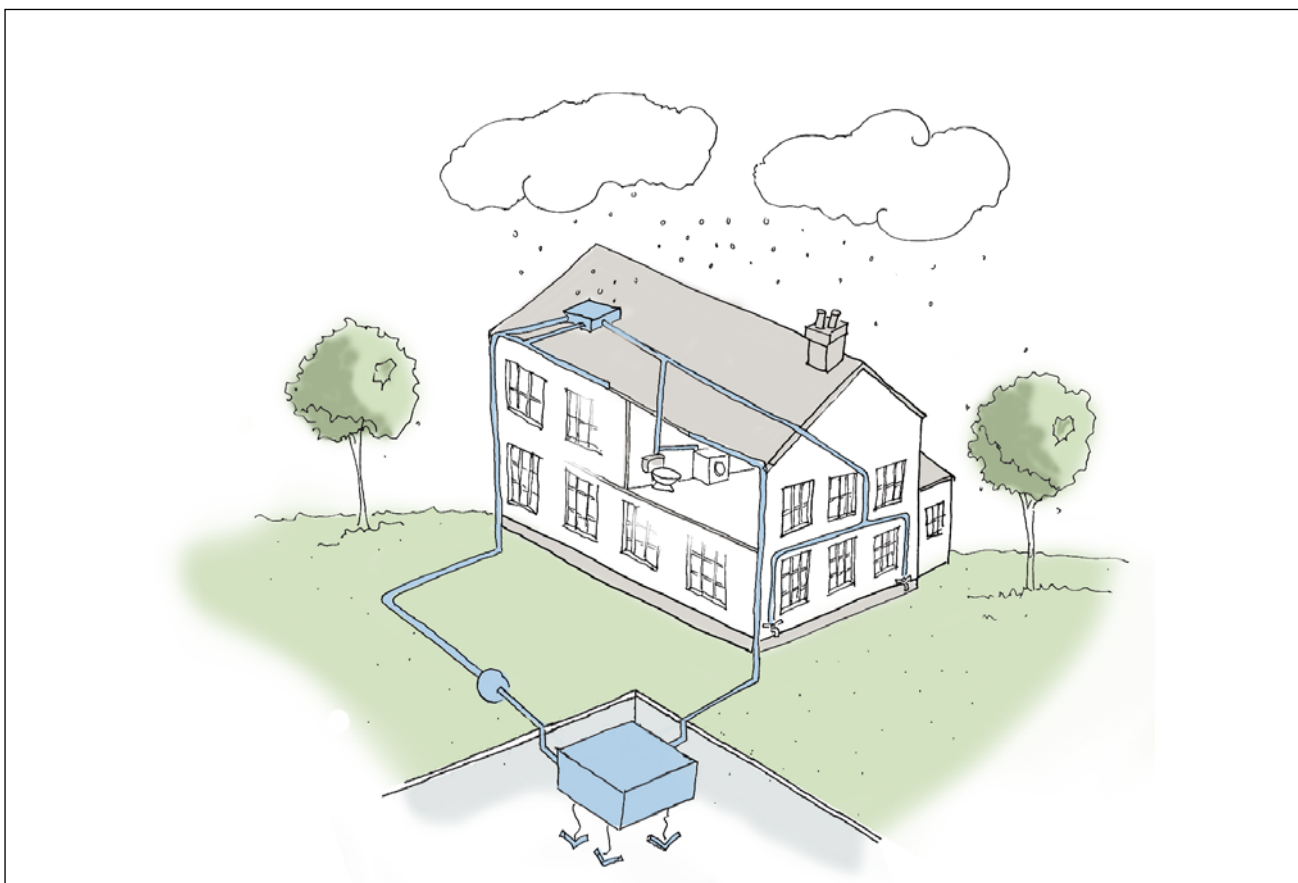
Sustainable water collection - harvesting rainwater by incorporating water butts is encouraged to enhance water sustainability and reduce the overall rainwater runoff of new development
